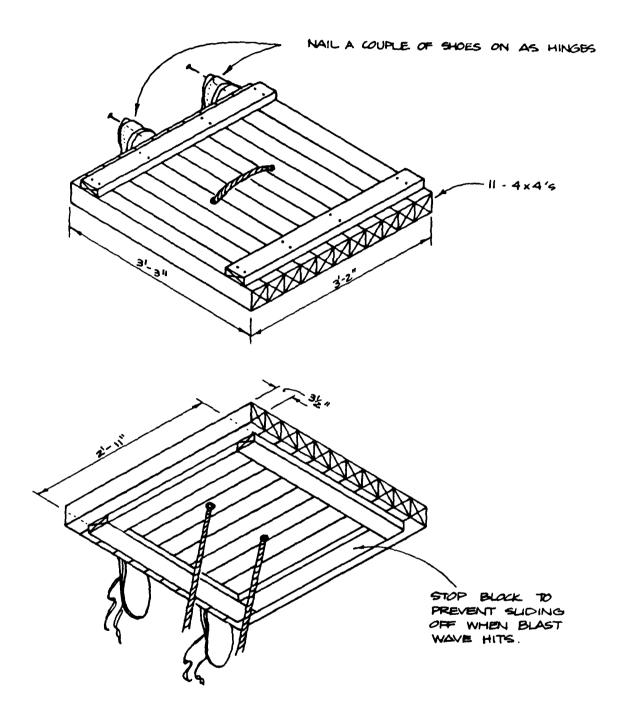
Closure for 40 psi Entrance Structure to Key Worker Shelter (Wood Construction).
